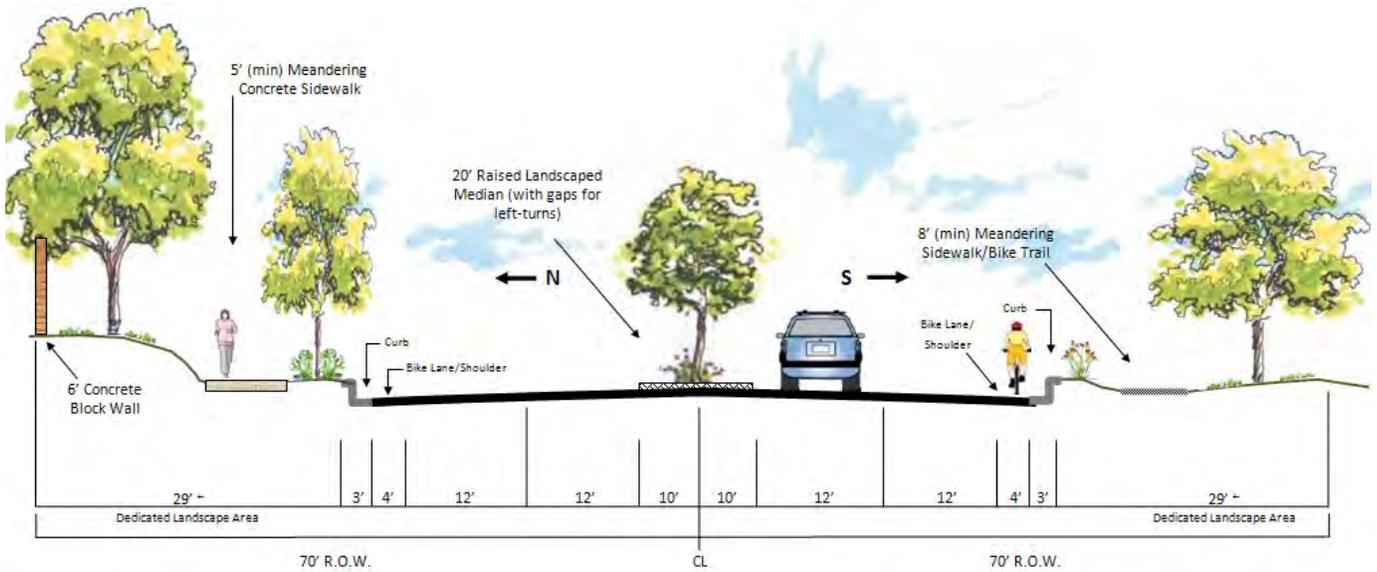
Douglas Boulevard- Standard Section.
